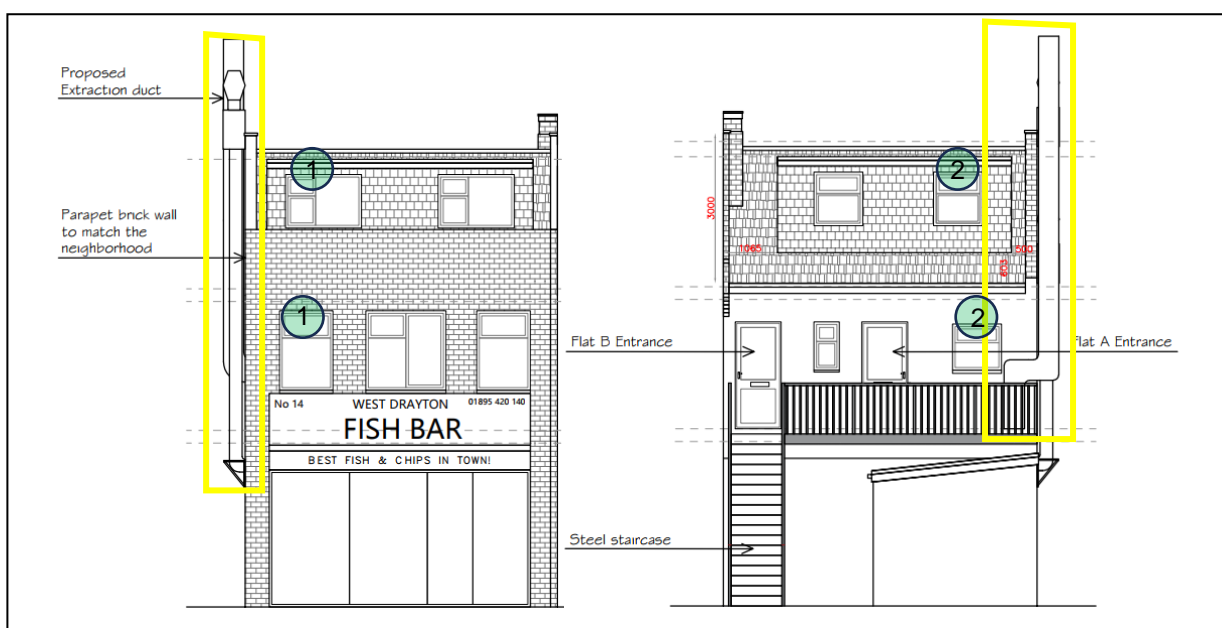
Indicative site plan indicating site (ground floor), closest noise sensitive receptors 1 and 2 (green) and plant locations (yellow)
